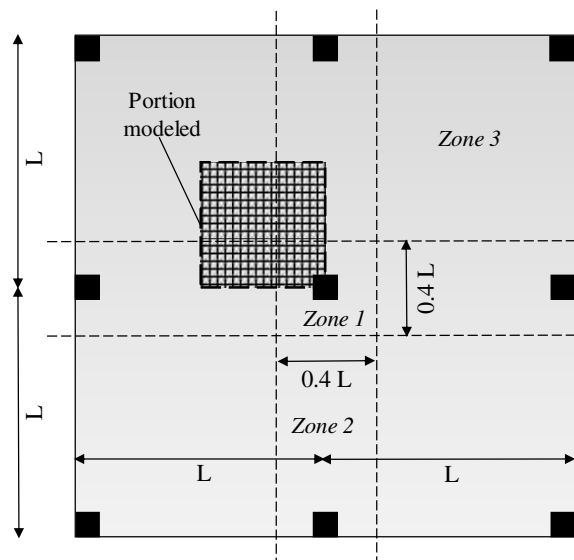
Self Confined slab: portion of modelled slab and layout of reinforcements zones.
